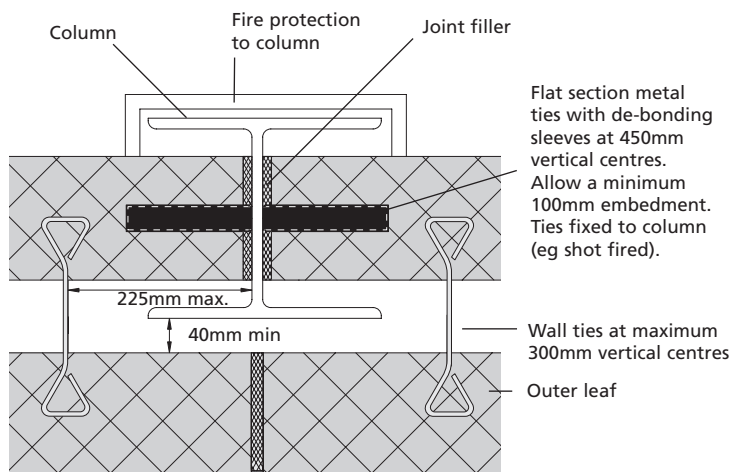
Movement joint to blockwork supported on a steel frame with internal pier
